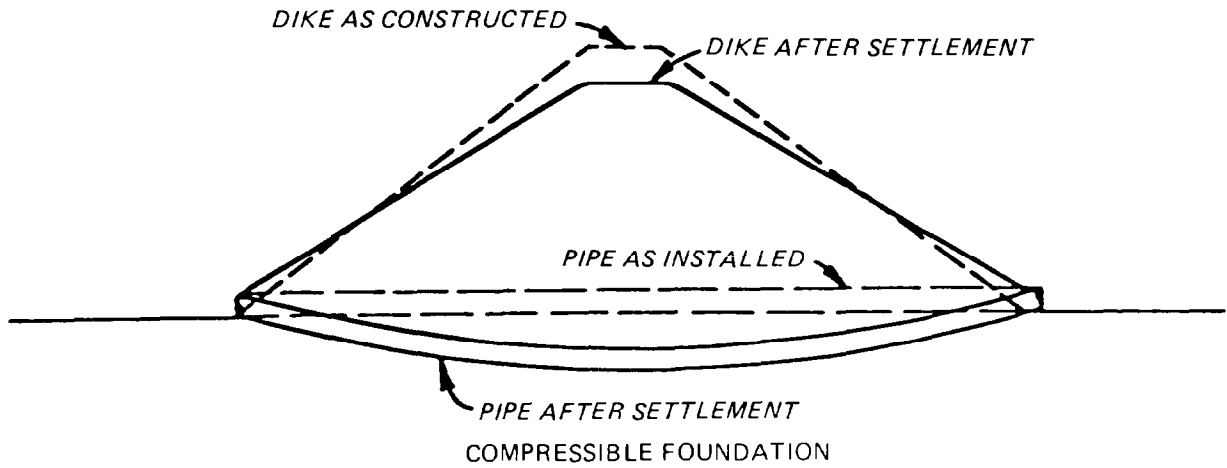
Swagging of pipe due to settlement of dike and foundation
